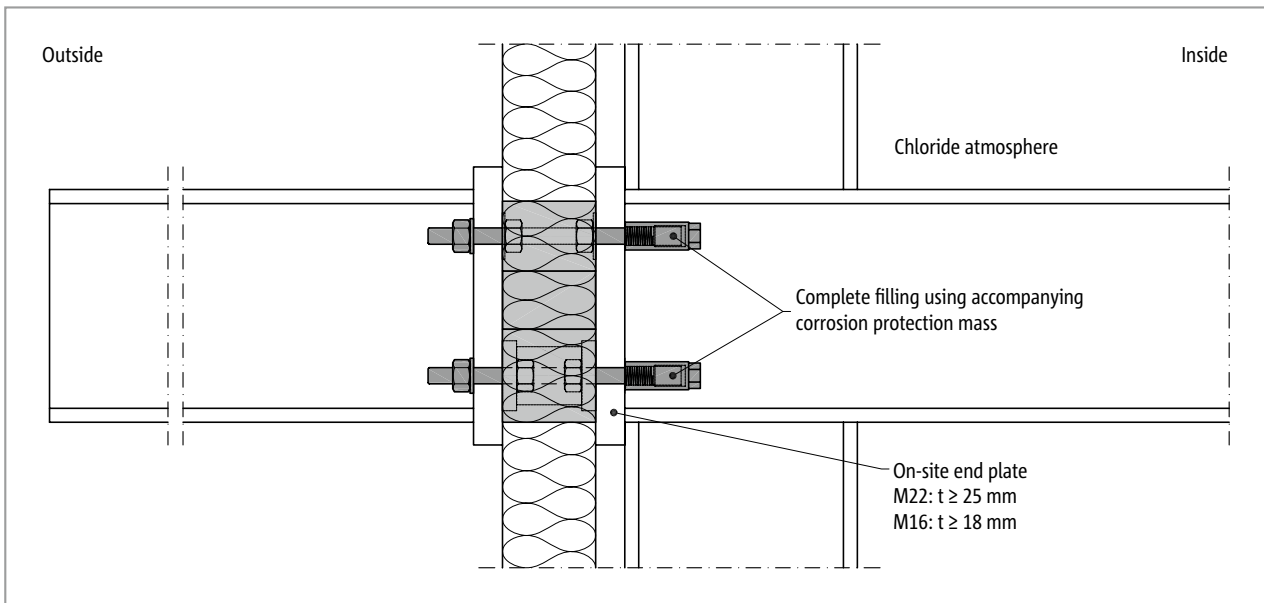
Schöck Isokorb® T type S with cap nuts: Cantilevered steel structure; internal atmosphere containing chloride
